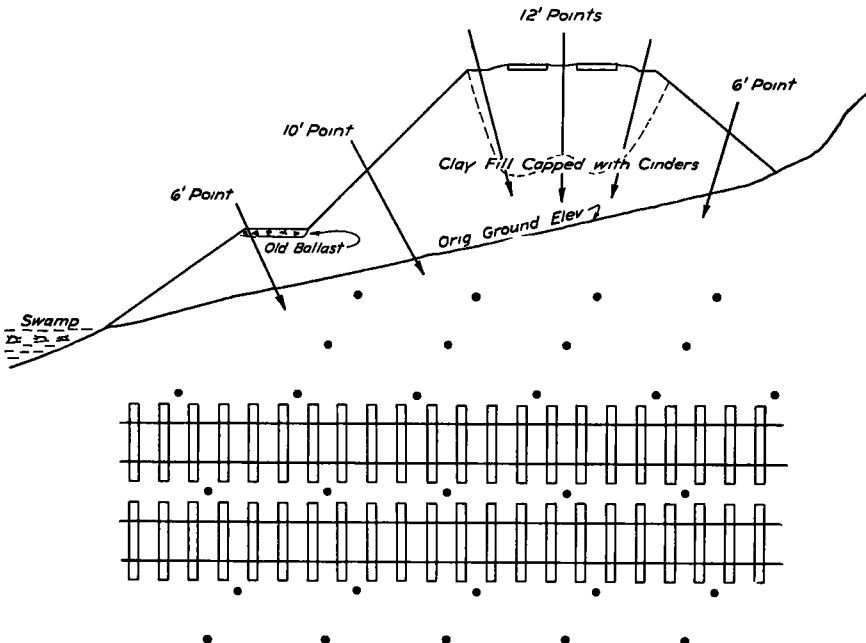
Pressure Grouting—Sliding Fill on Foundation and Typical Injection Plan
